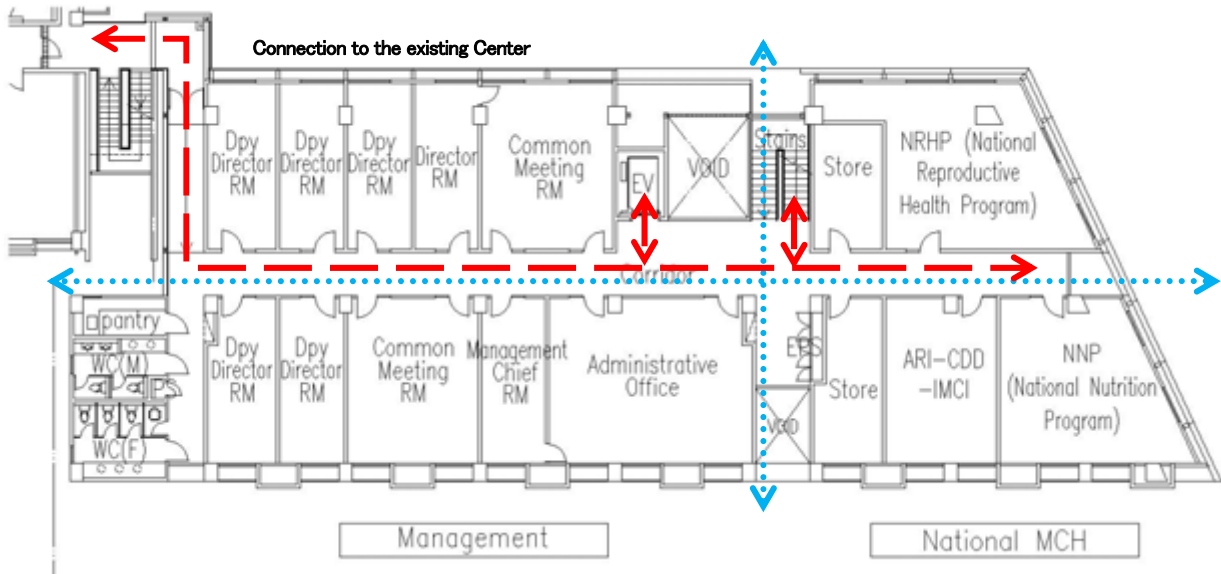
Training Center 2<sup>nd</sup> Floor Plan
